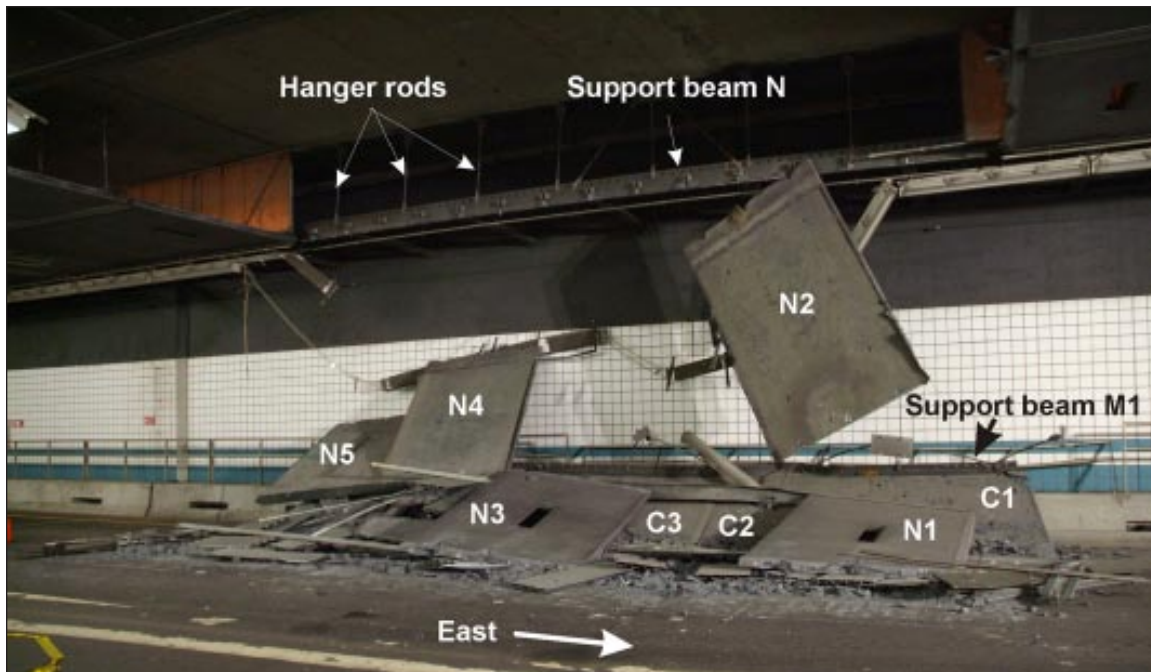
Looking north at the collapsed concrete panels before removal from the tunnel. Components shown as labeled for postaccident reconstruction. (Photograph courtesy Massachusetts State Police)
